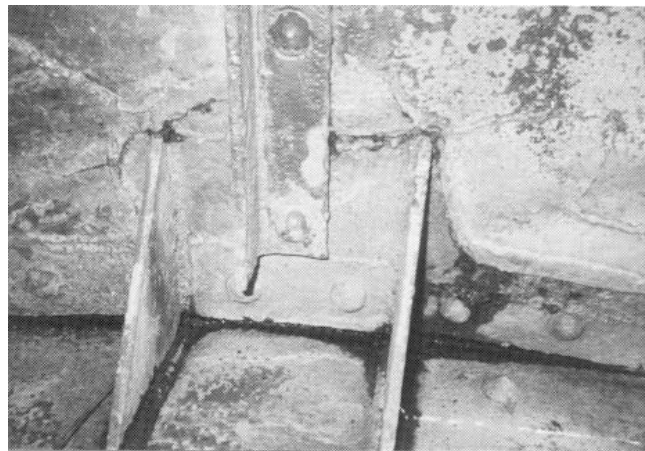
Fatigue crack at weld repair on roller gate end shield
